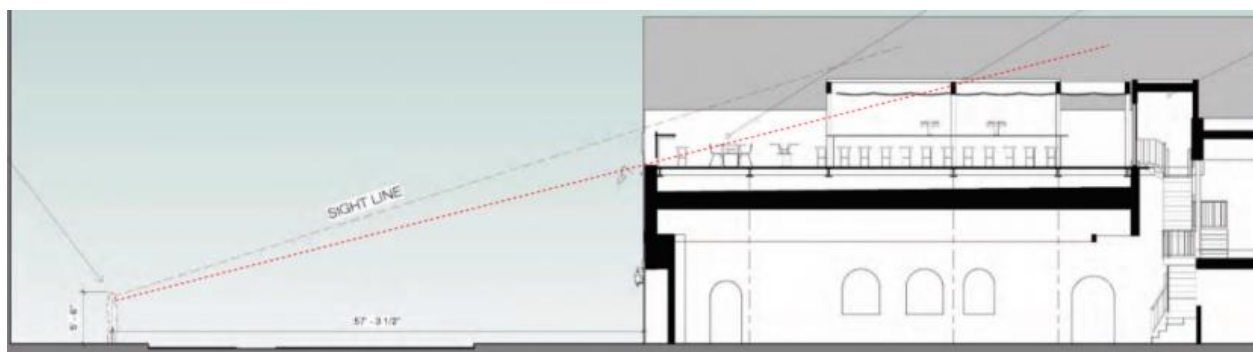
Line of site diagram showing area of roof deck visible from King Street
